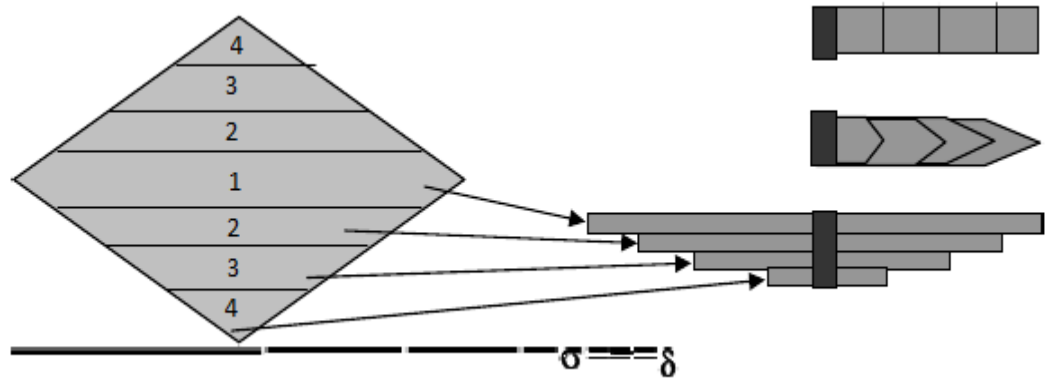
Lozenge shaped beam is cut into laminated beam.
